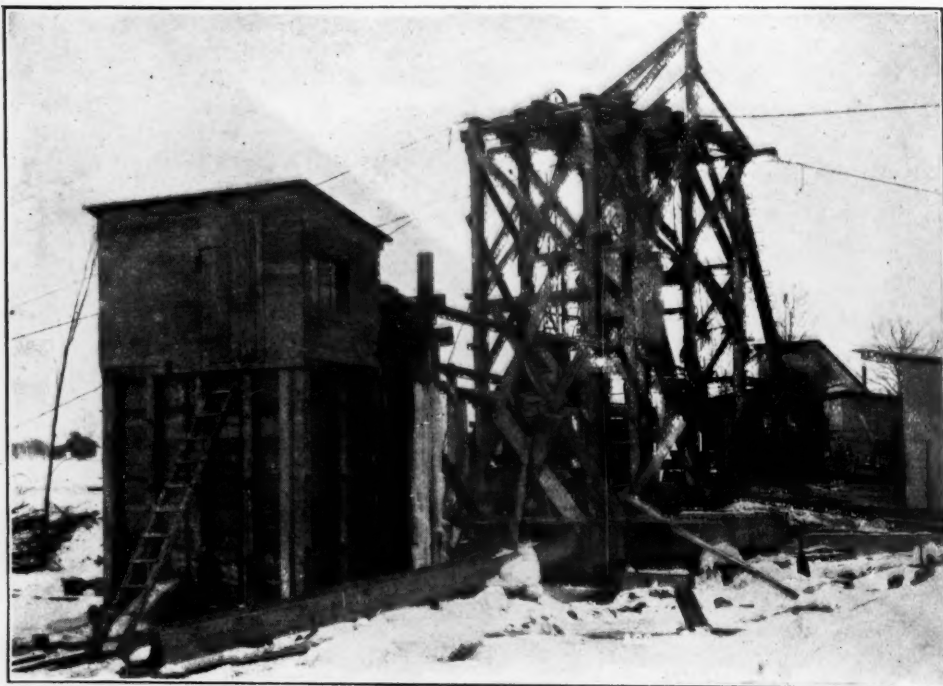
HEAD HOUSE AND A CAMERON TANDEM SINKING PUMP.
